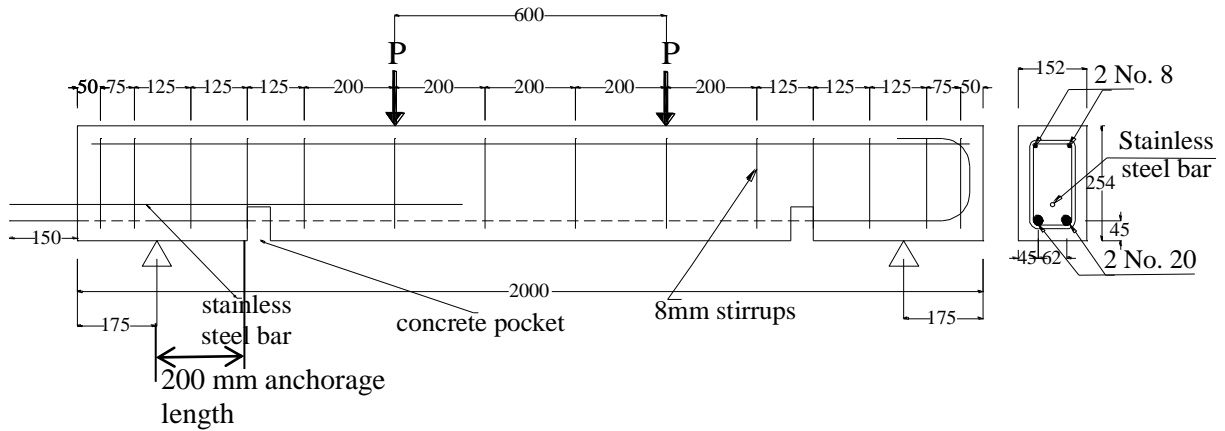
Longitudinal and cross-sectional details for the beams in group 2-Set 1 (All dimensions are in mm). The dashed part of the steel reinforcement represents the unbonded length.
